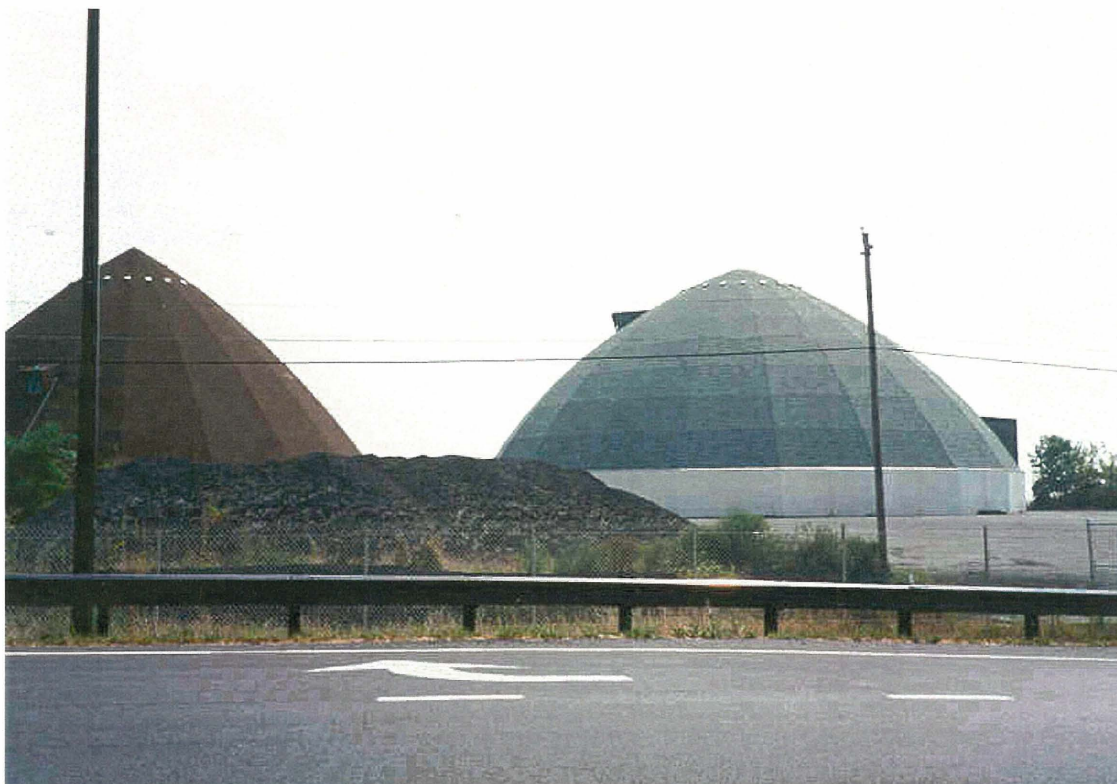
SHA Salt Storage Domes, MD Rte. 121 at I-270
